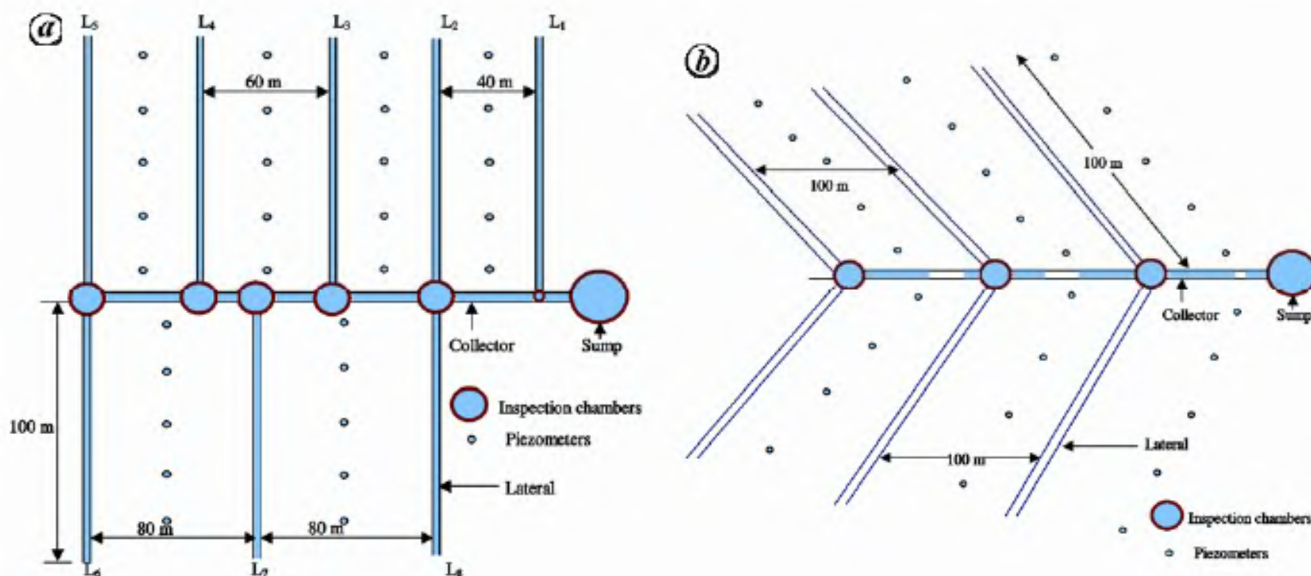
Layout plan for subsurface drainage system in (a) Gridiron pattern and (b) Herringbone patterns.
